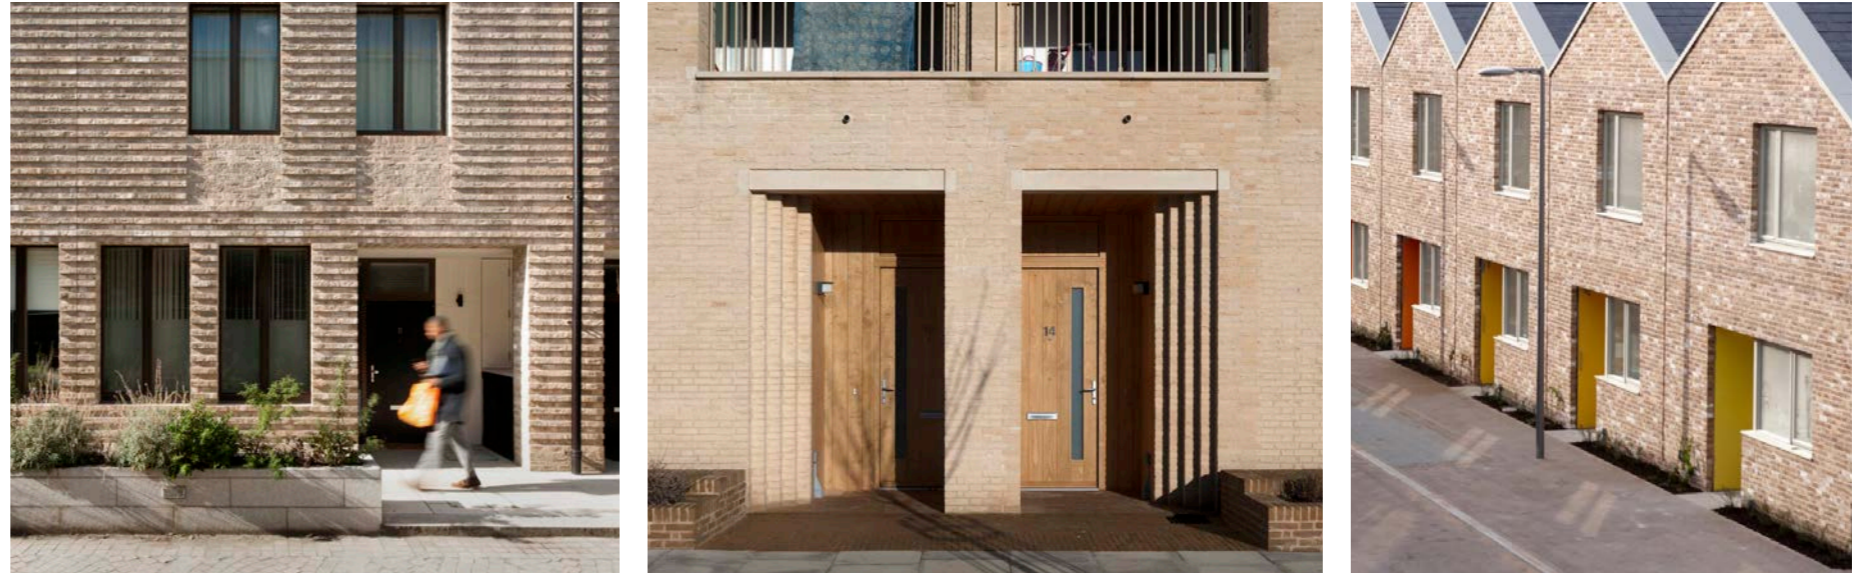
Examples of individual entrances showing pairing of front doors, recessed entrances, brick detailing celebrating the entrance and front garden built in planters
